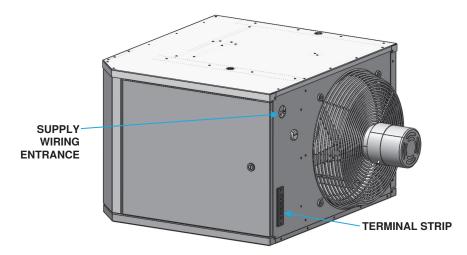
Supply Wiring Entrance and Control Connection Terminal Strip
